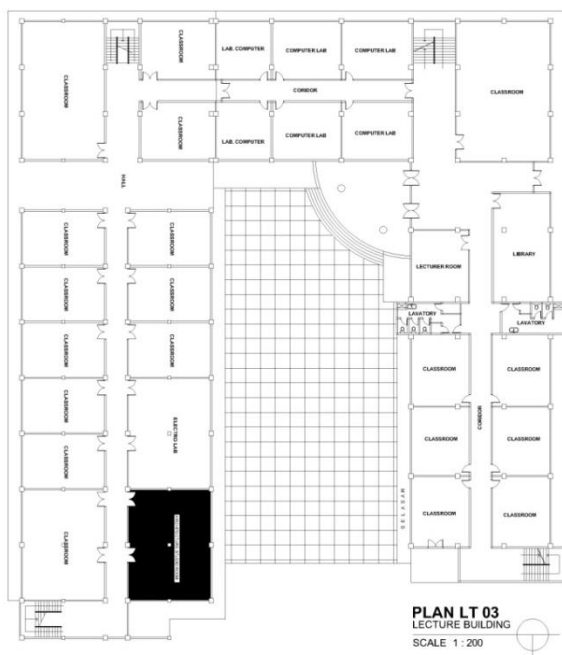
Floor plan 3 Universitas Ichsans Gorontalo
